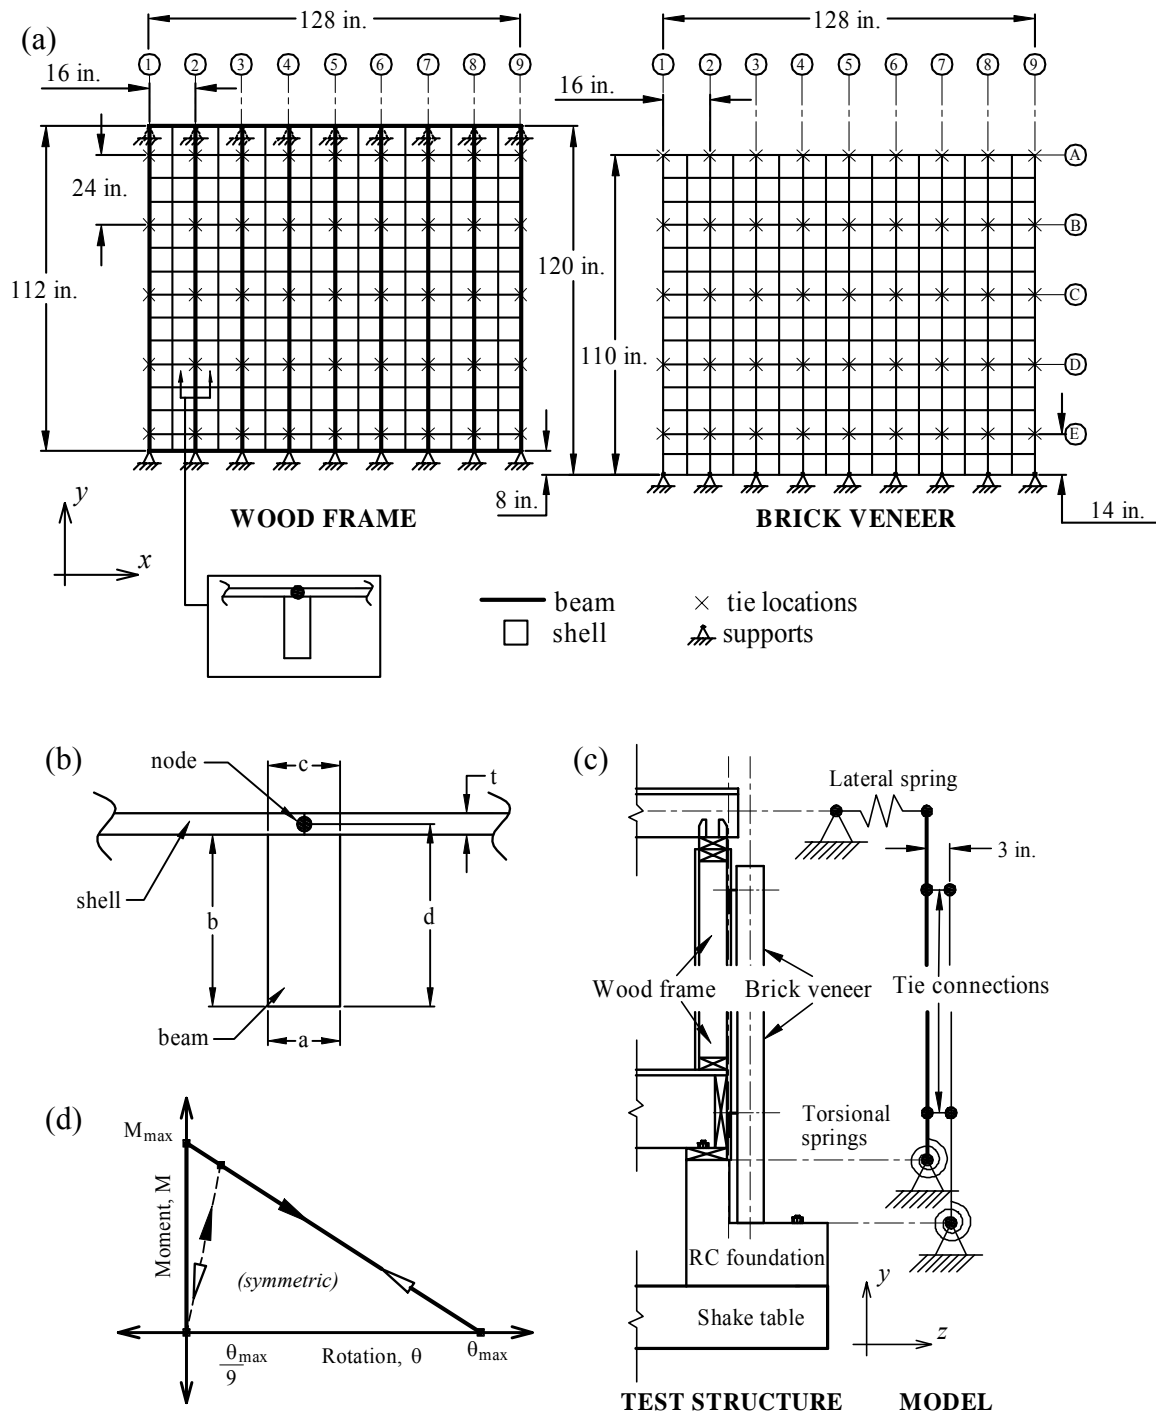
(a) FE wall model geometry elevation views, (b) stiffened shell model (OSB sheathing with stud), (c) wall support details, and (d) bi-linear elastic brick masonry rocking behavior model.
